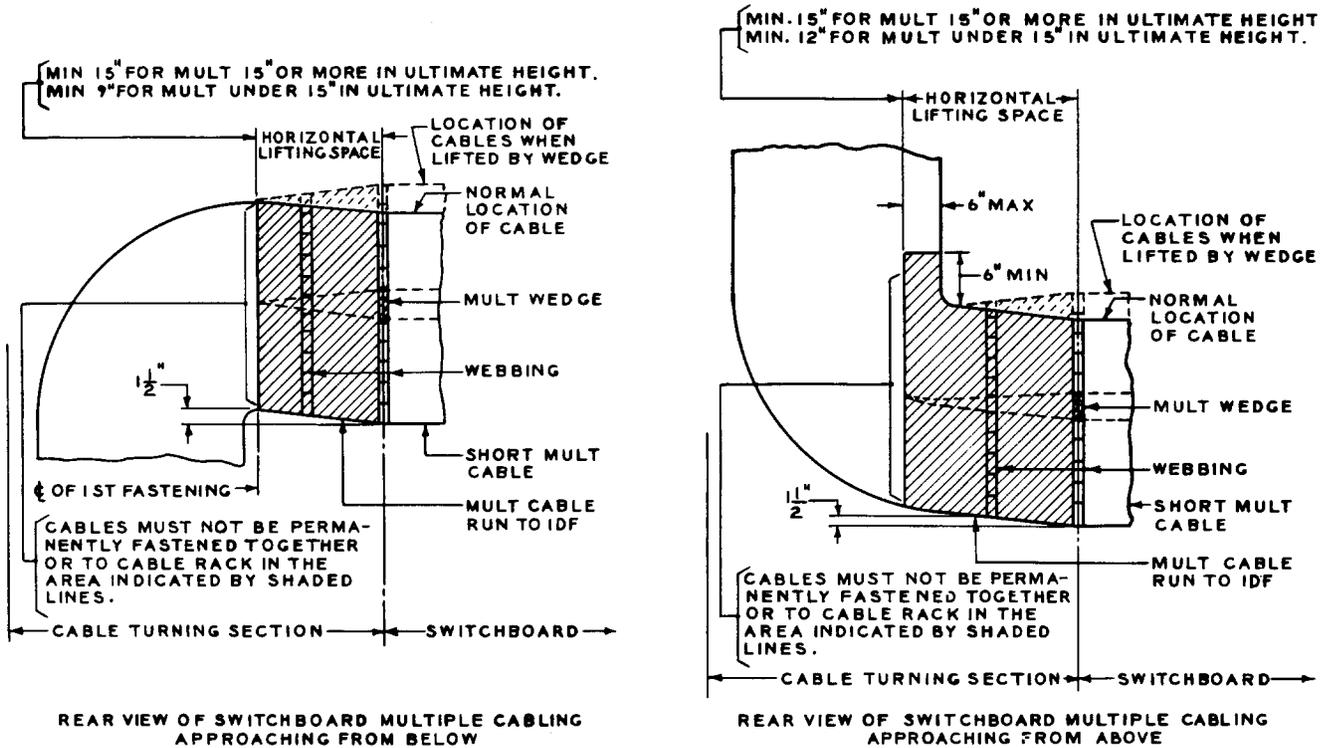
Cabling In Switchboard Cable Turning Sections
